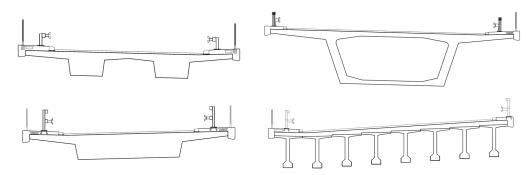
Bridge types used (ribbed section (top left), box girder (top right), slab girder (bottom left), precast girder (bottom right)).
